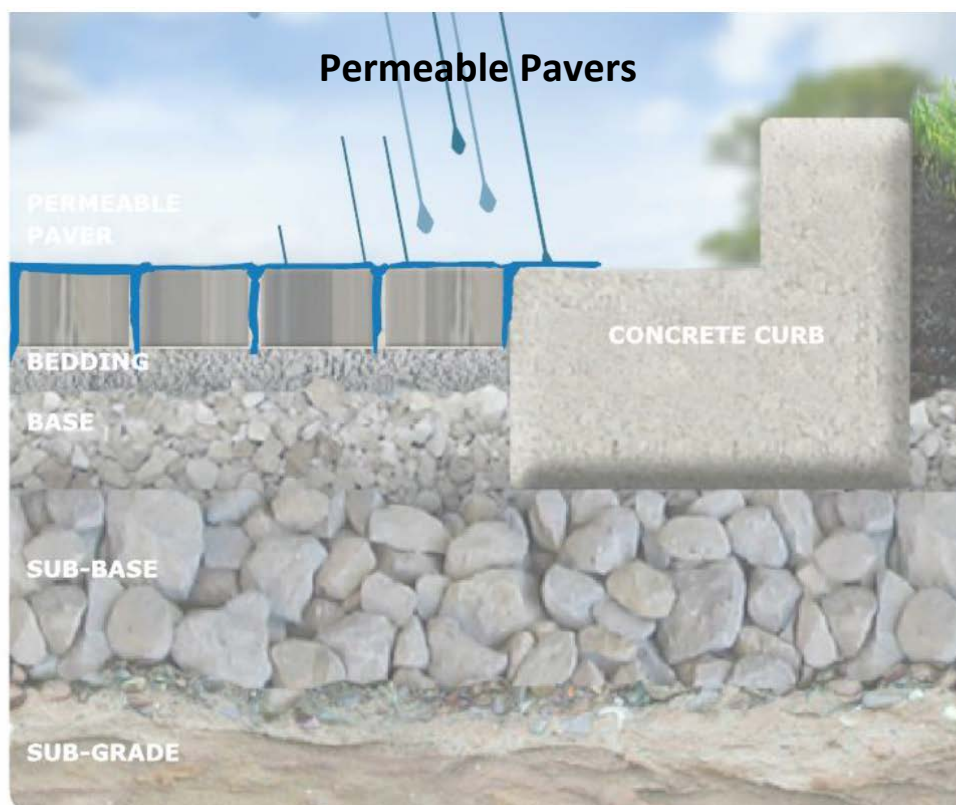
Example of a Permeable Paver Parking Lot Cross-Section (APT, 2011)
